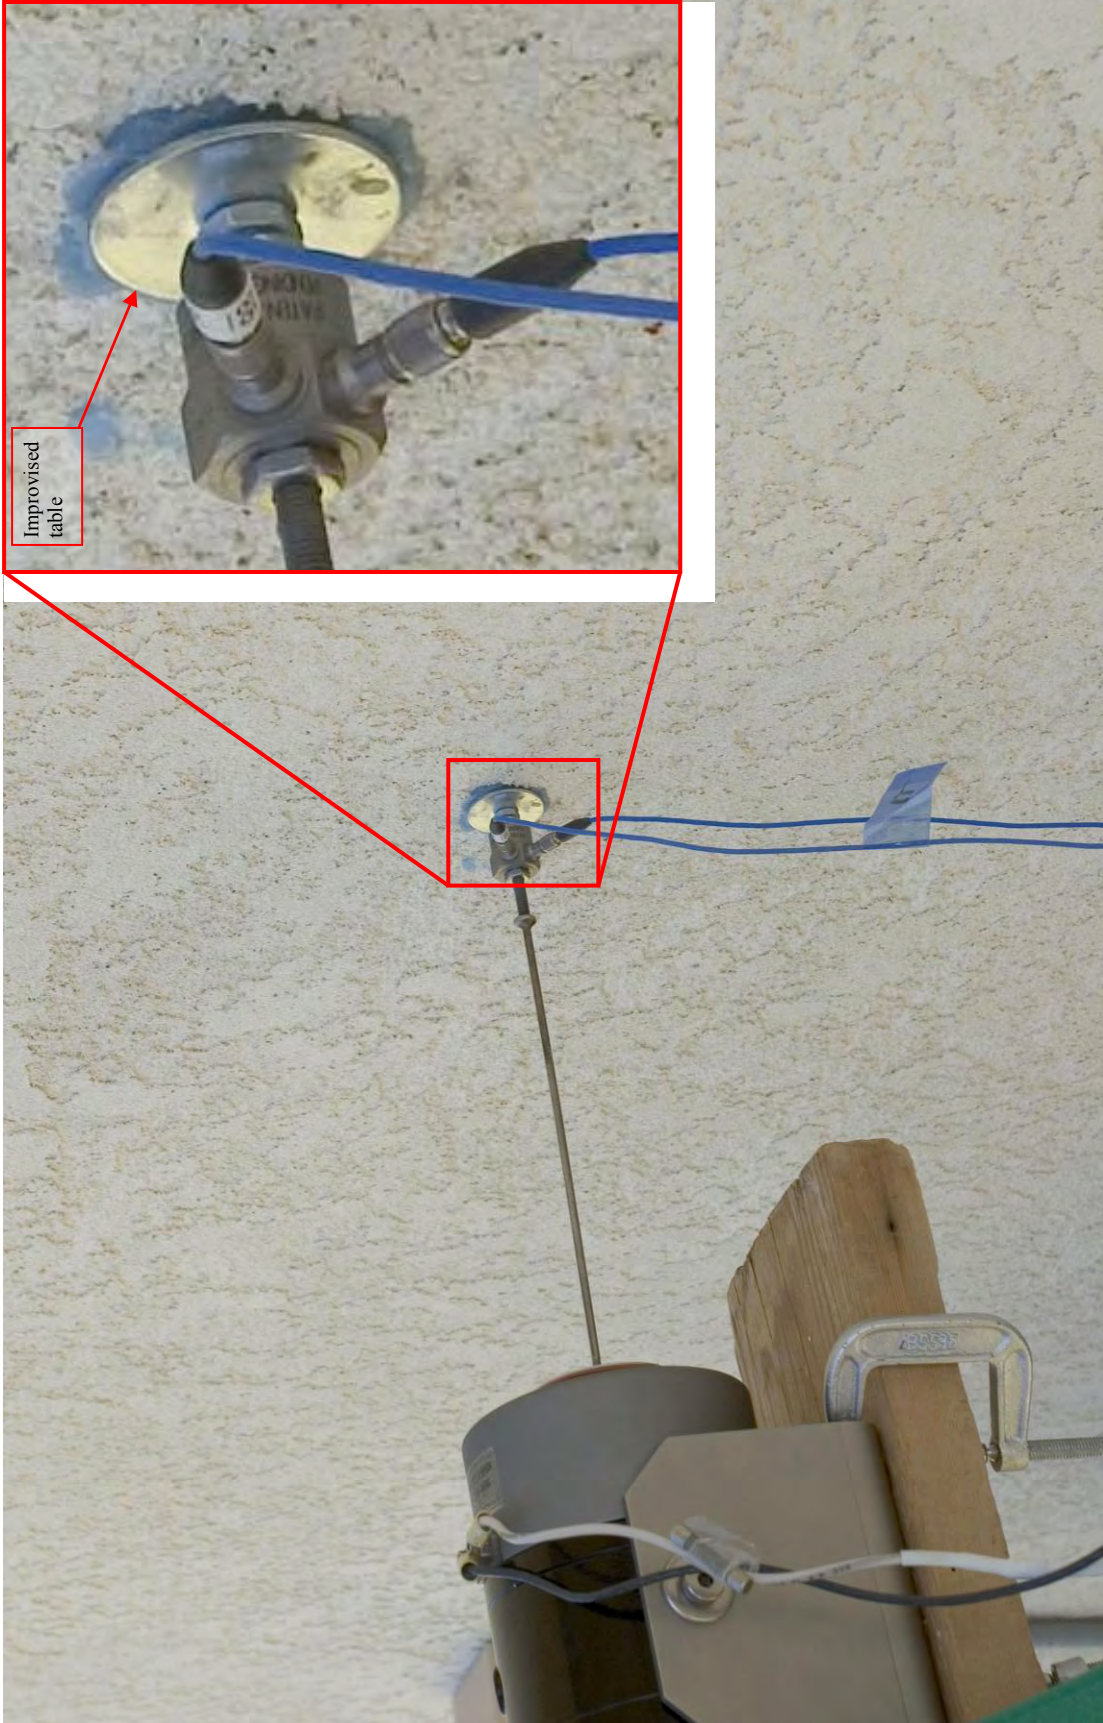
Shaker attached to the stucco on the exterior of the south wall of the master bedroom.
